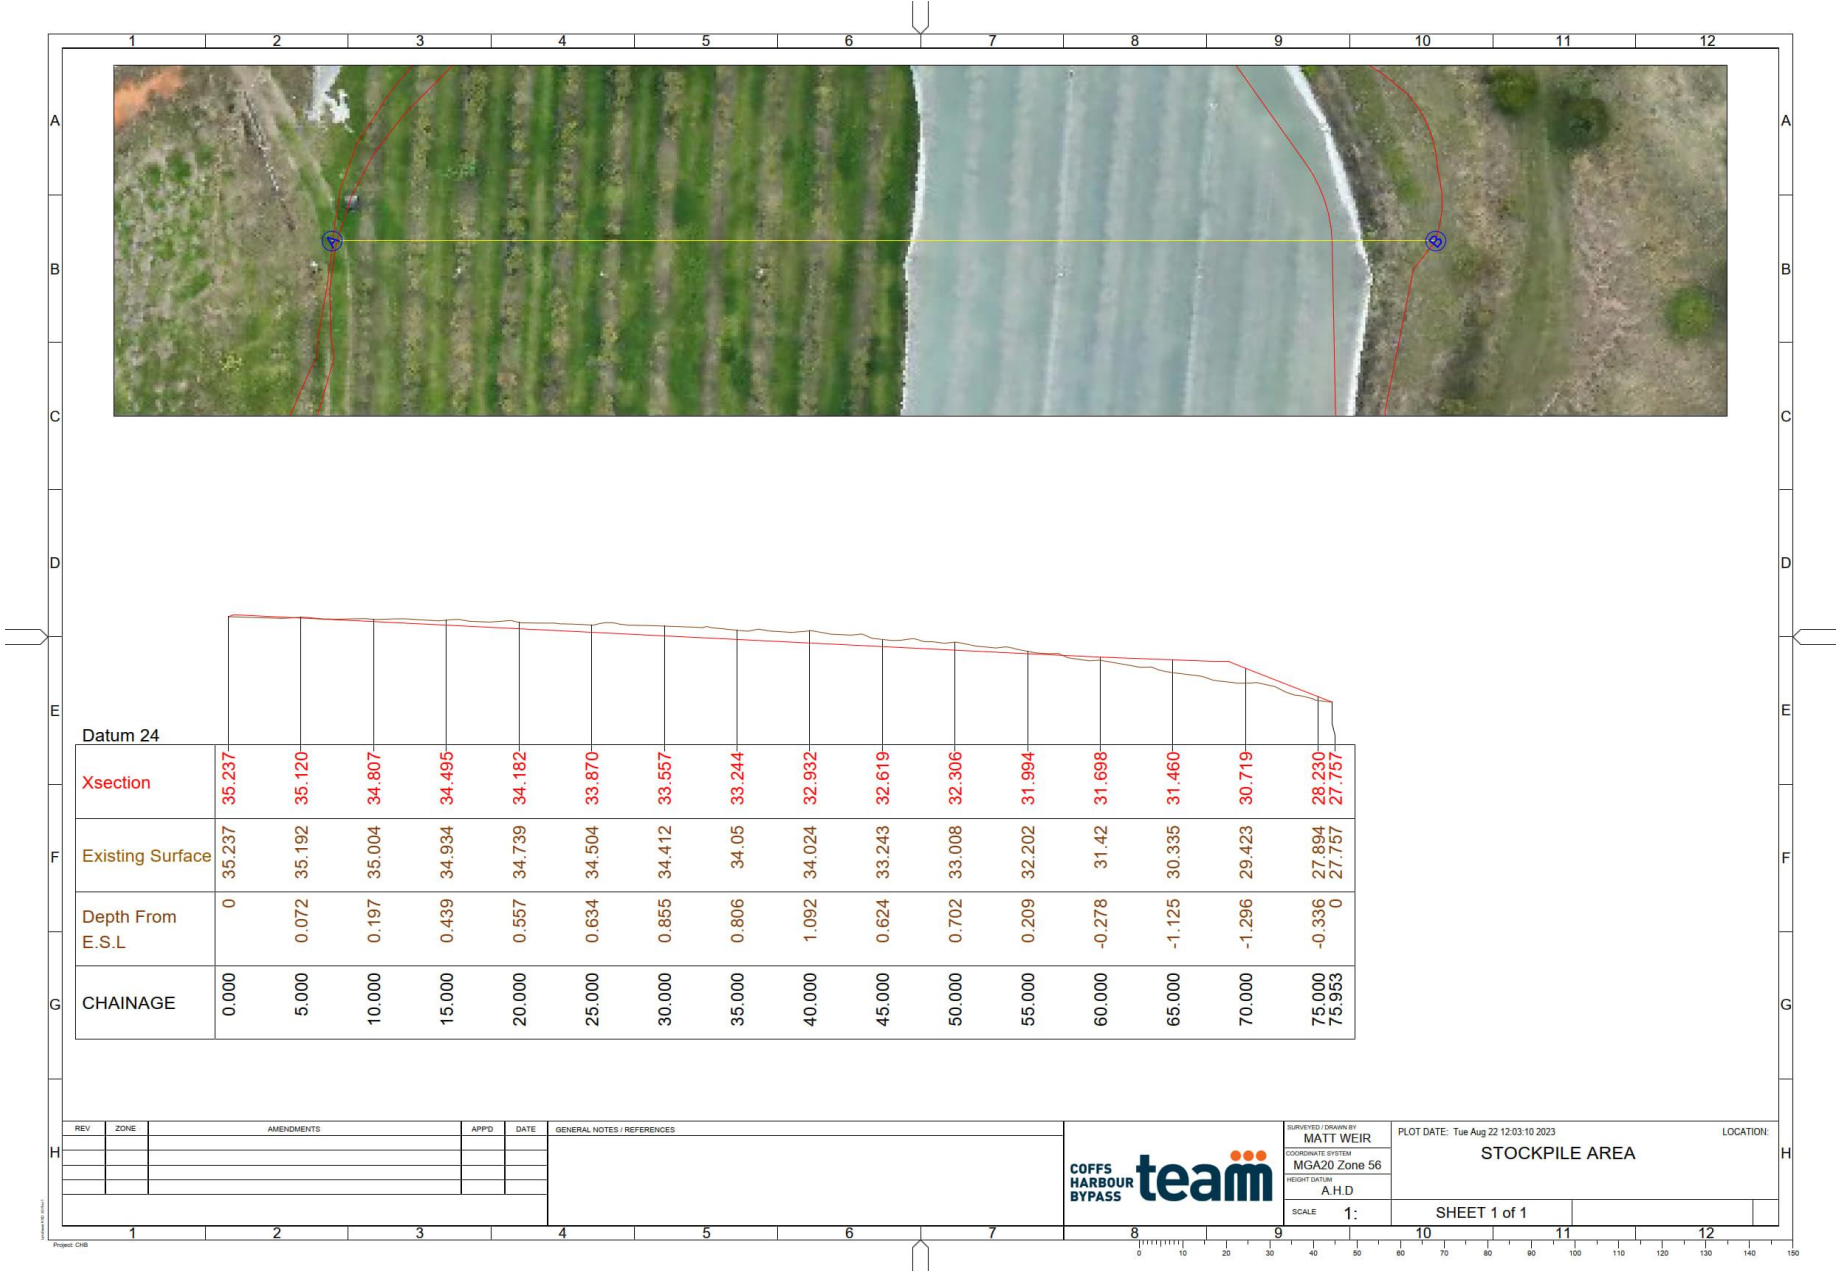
PROPOSED ANCILLARY FACILITY BOUNDARY – CUT FILL CROSS SECTION
